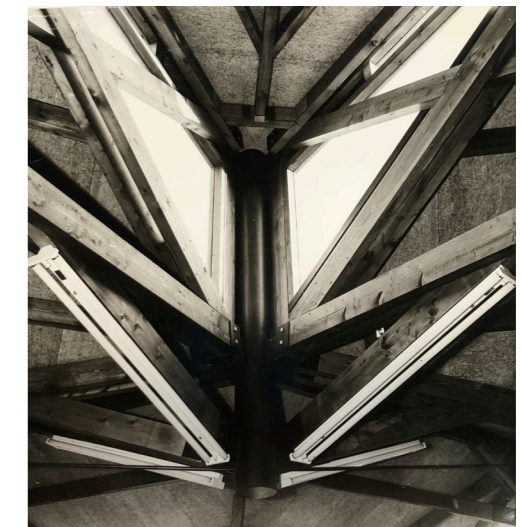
Het Nieuwe Instituut, Knot roof construction classroom.
